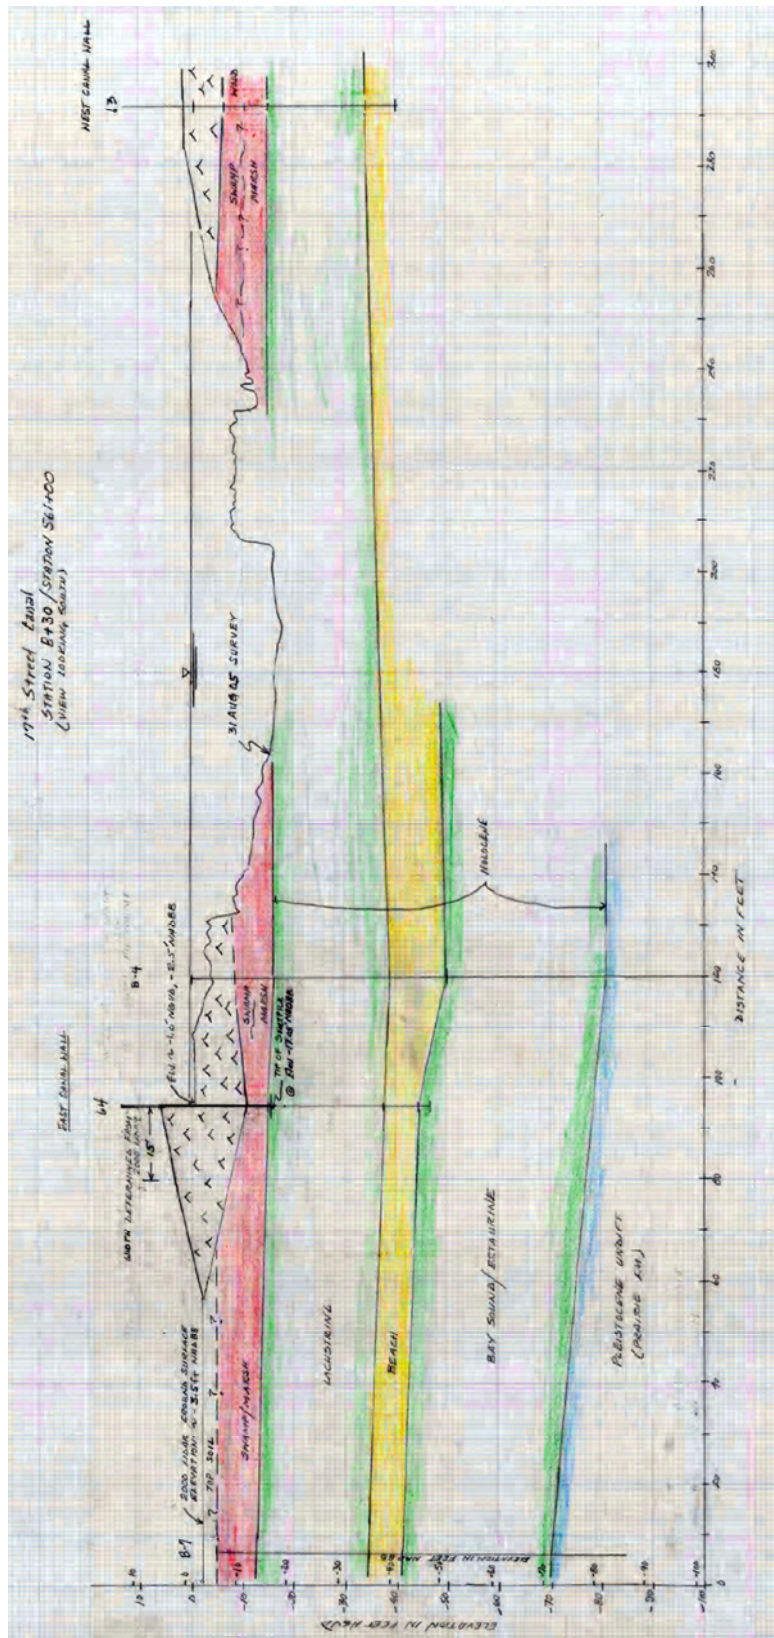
Prefailure Cross-Section at Sta 8+30 (New Stationing)/ Sta. 561+00 (GDM Stationing)
